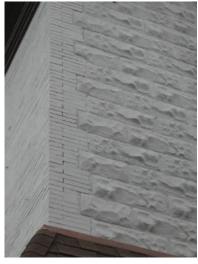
Concrete block and brick masonry exterior at 613 Valley Road.
